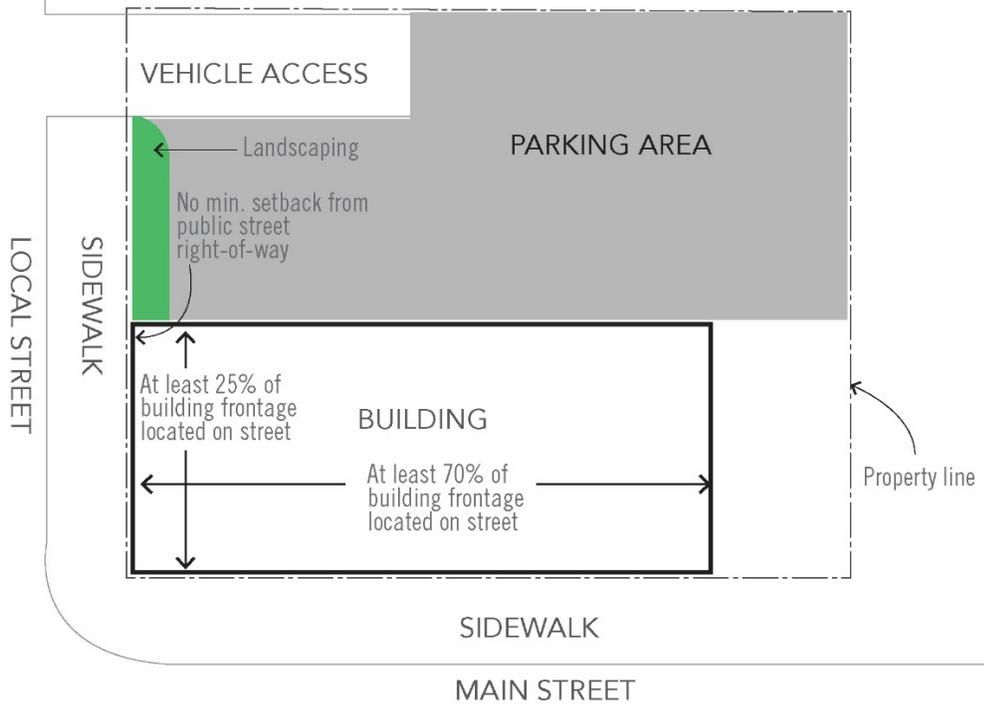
C. Building Placement and Location of Parking, Local Street/Local Street Intersection (typical)
